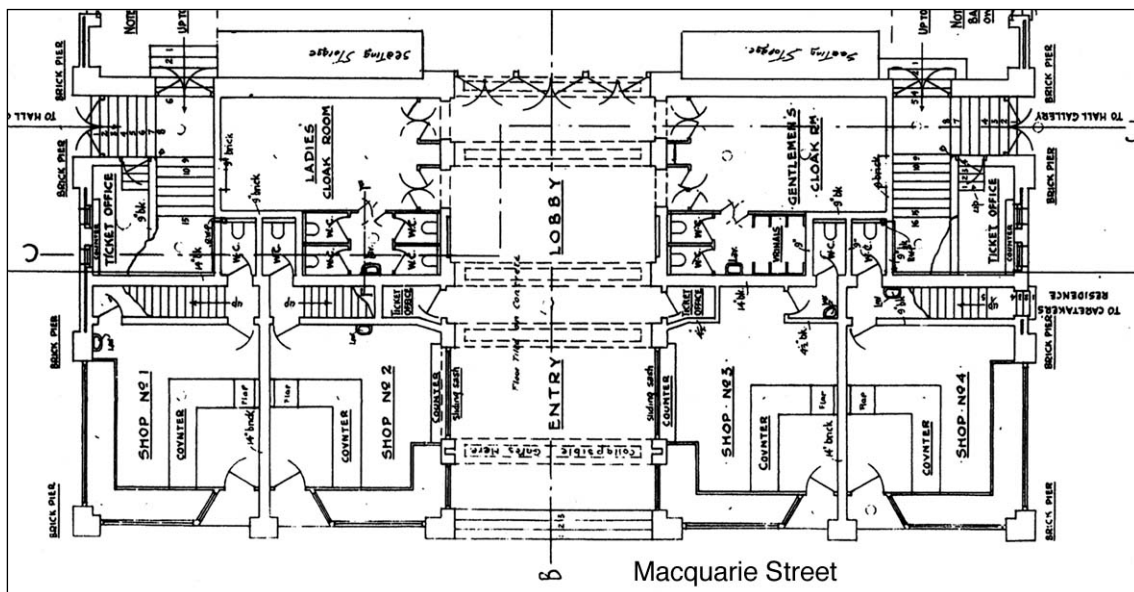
1914 plan of City Hall foyer area (detail of HCC Drawing A7² — 8612/02).
